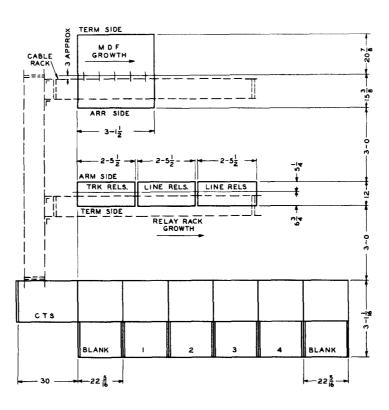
No. 2600 Switchboard -Floor Plan (Kellogg Switchboard & Supply Co.)
